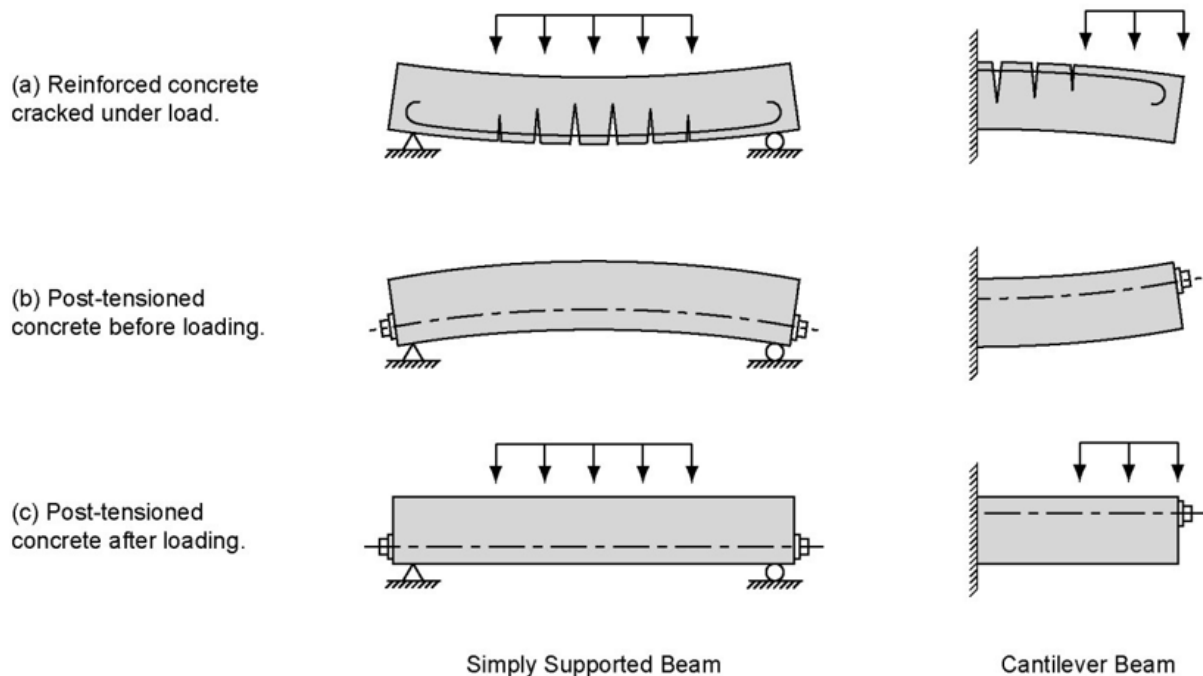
Comparison of Reinforced and Prestressed Concrete Beams
